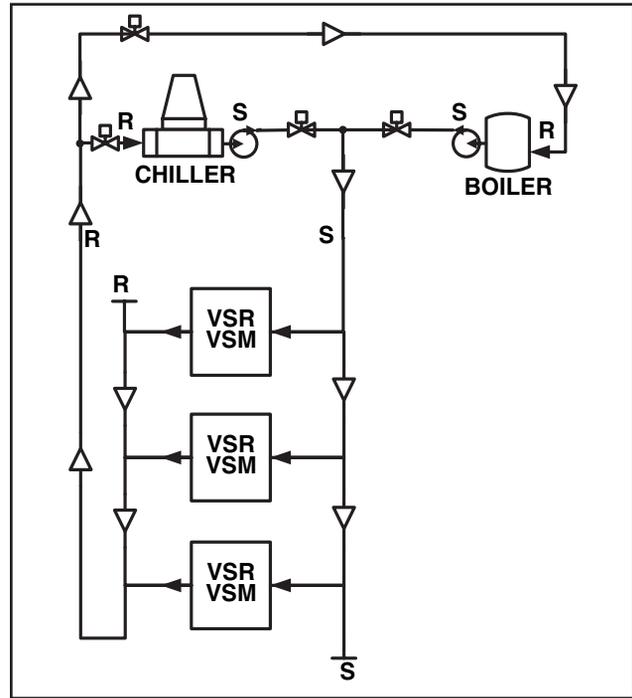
Piping Layout for a Vertical 2-Pipe System with Reverse Return Piping
